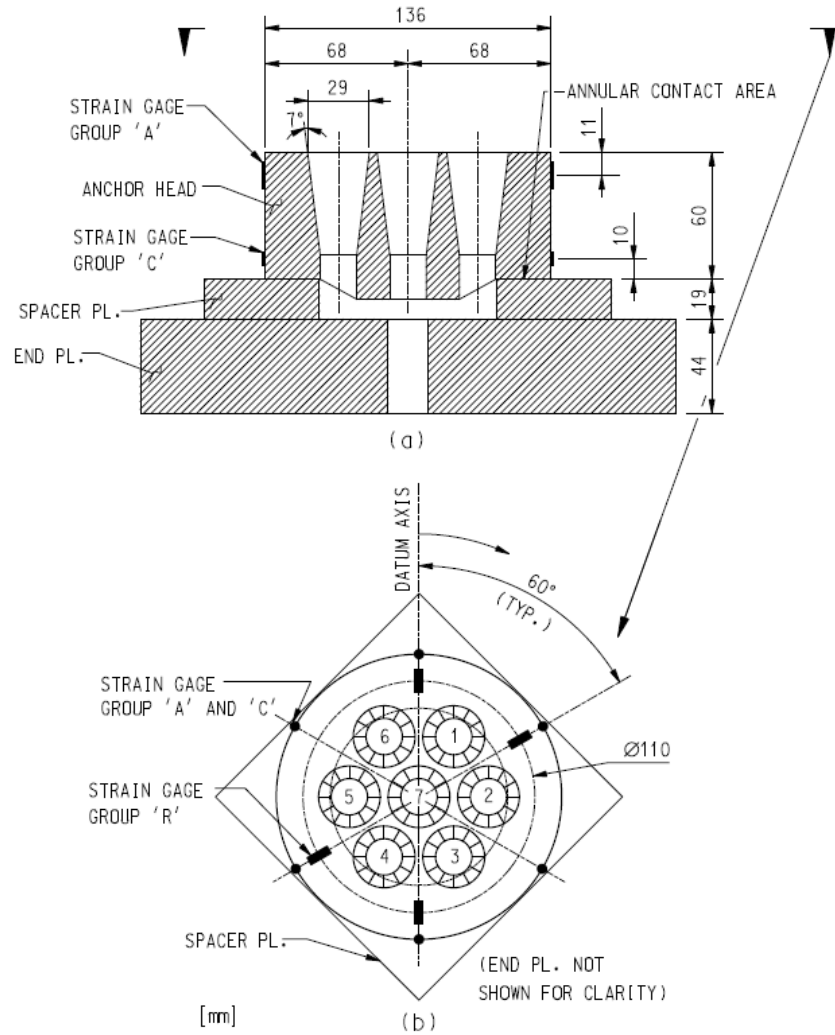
Strain gage placement on ECI 6-7 anchorage: (a) anchor head elevation; (b) plan
